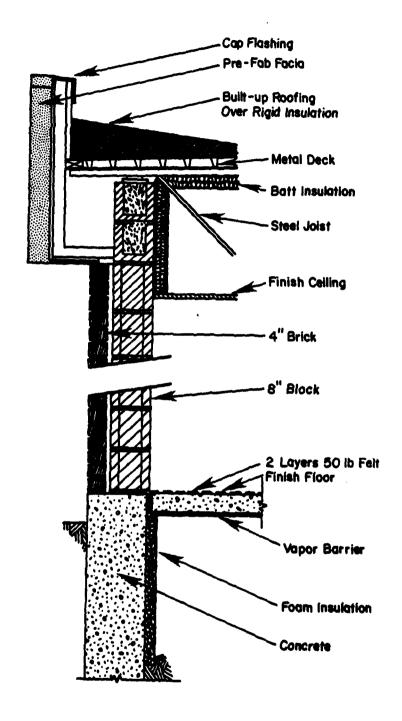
Battalion headquarters and classroom wall, floor, and ceiling details.
